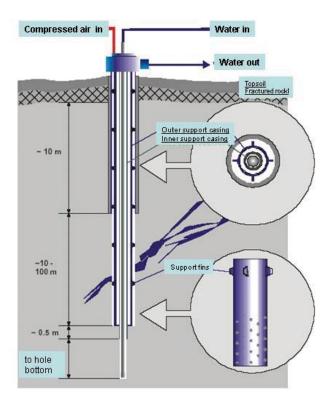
In the telescopic part of the drill hole a temporary installation is made with casing tubes for support and alignment and equipment for air-lift pumping. In the uppermost part the return water discharge header is mounted. The water discharge is led to the settling containers.
